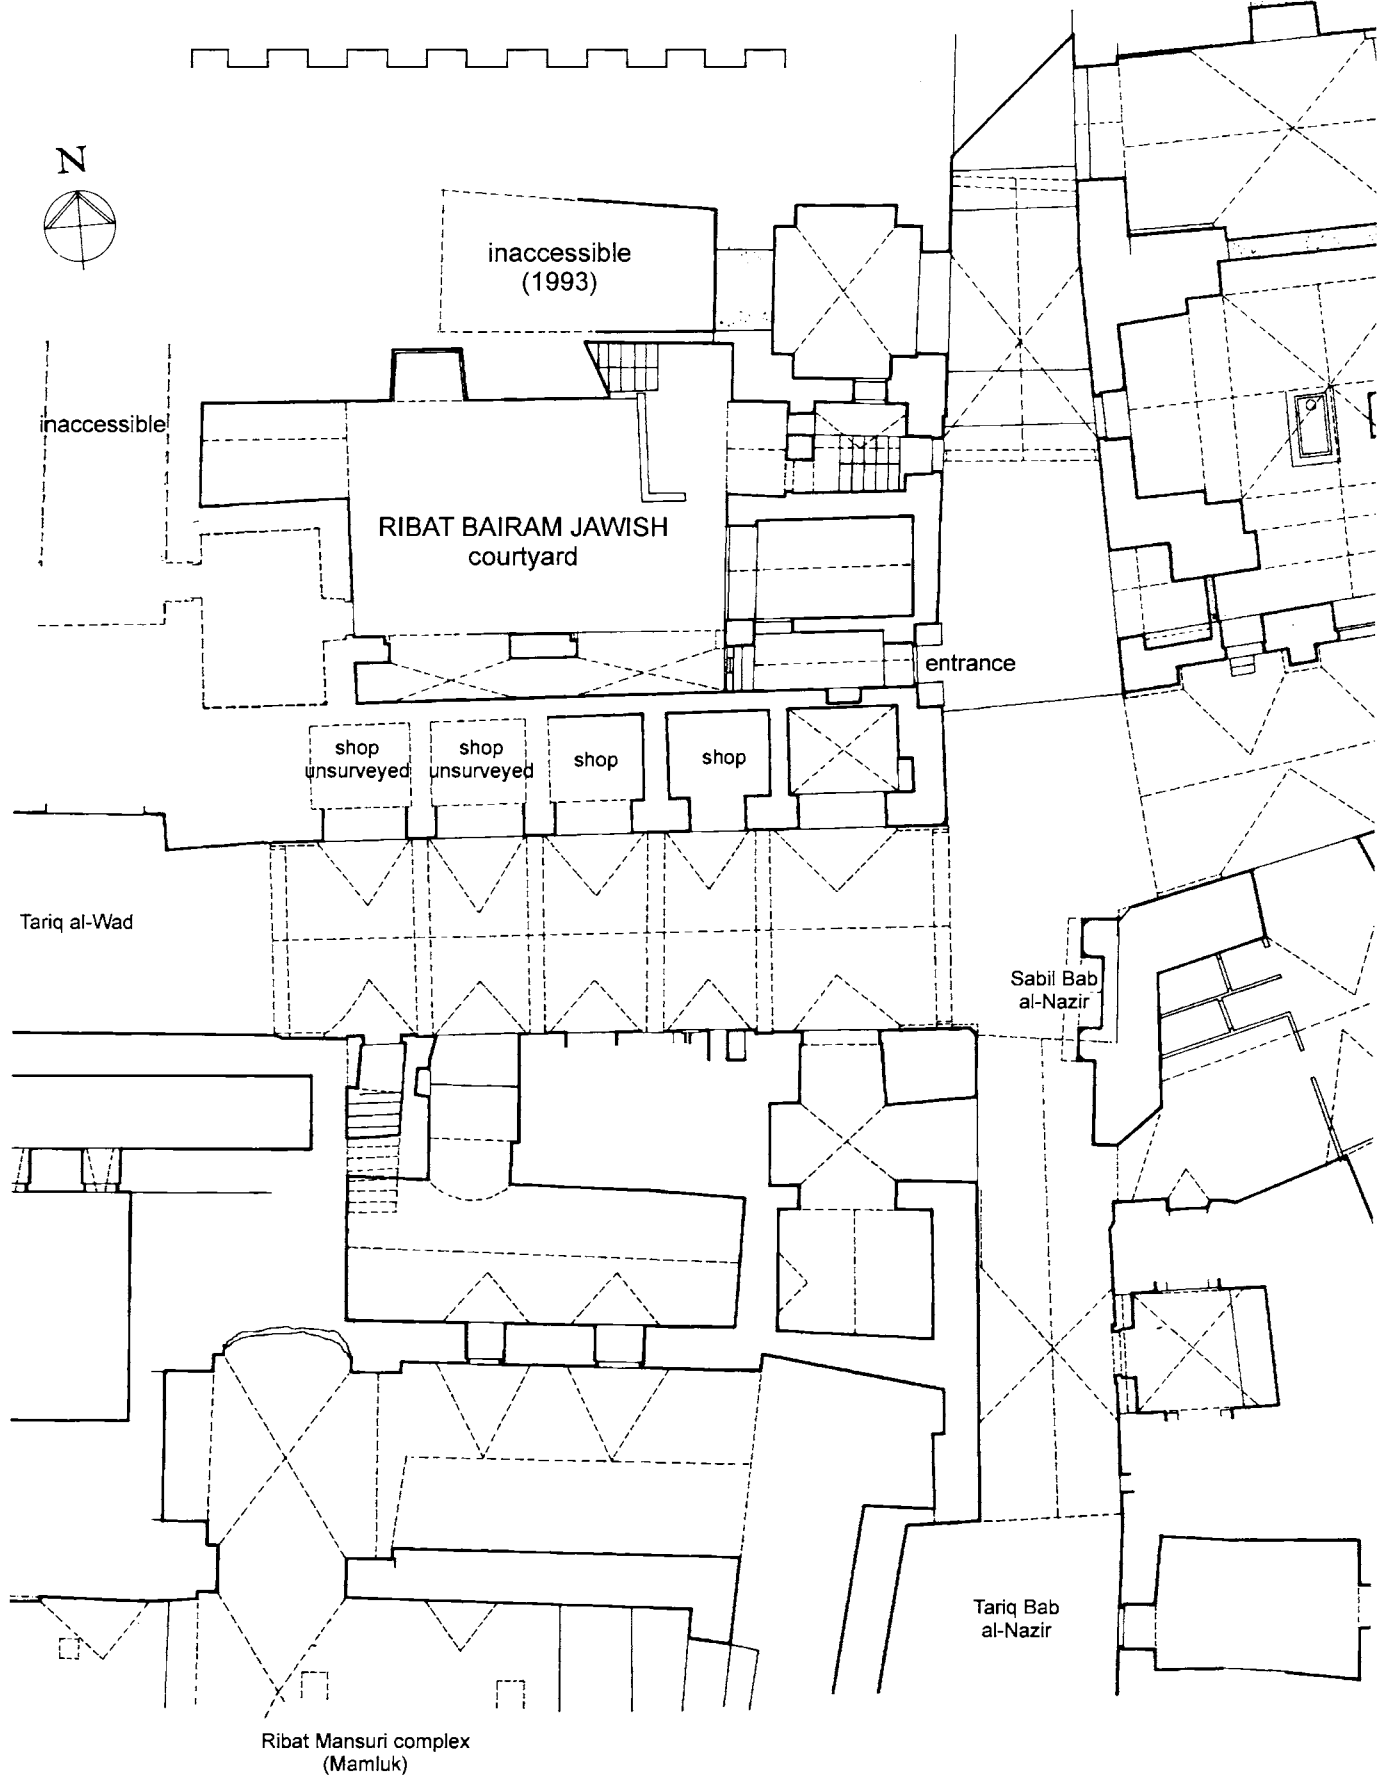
Ribat Bairam Jawish, ground plan of complex.
